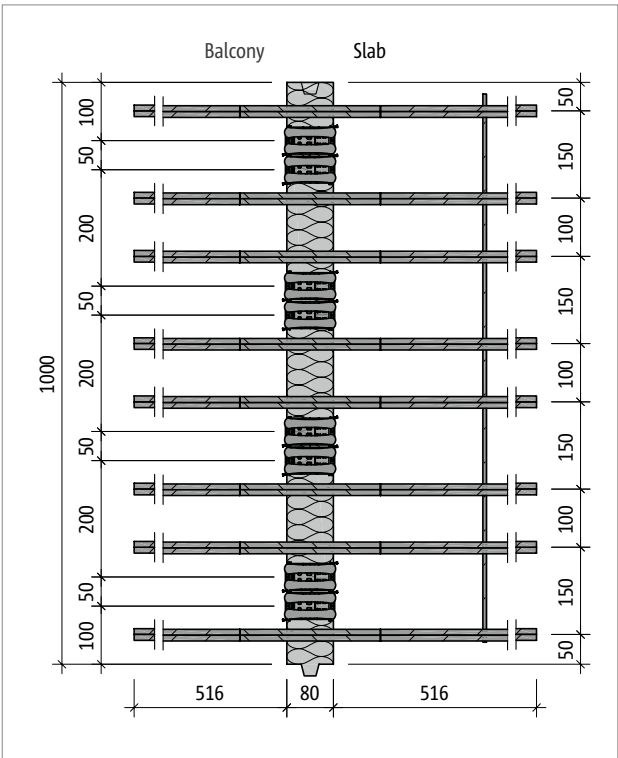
Schöck Isokorb® T type Q-E-VV5: Product layout
